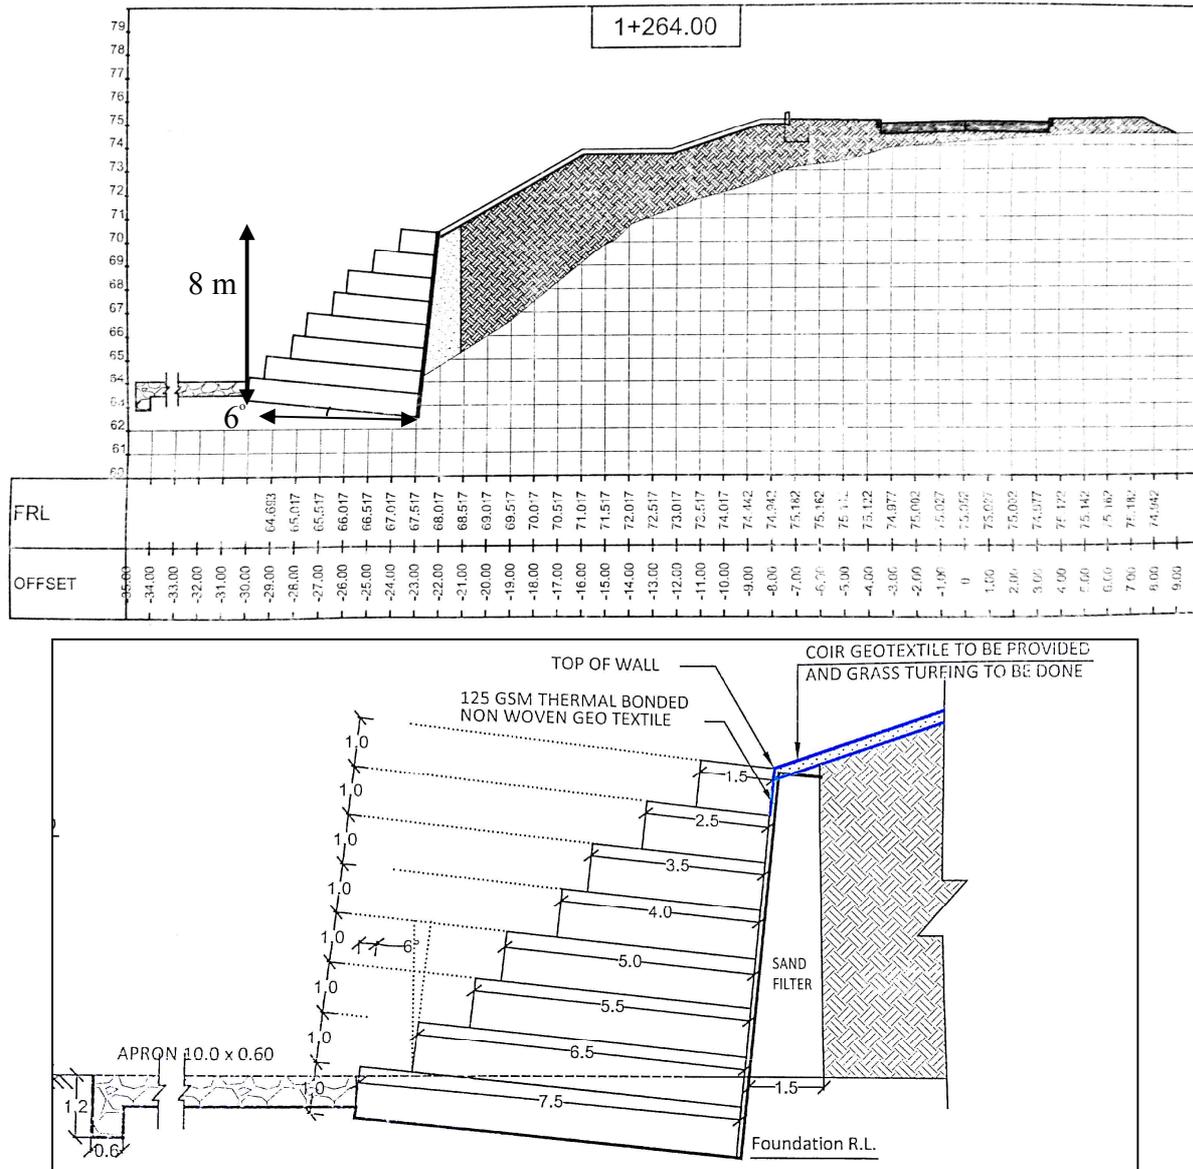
Elevation of gabion gravity wall (a) A general view, (b) Detailed components of gabion gravity wall system
